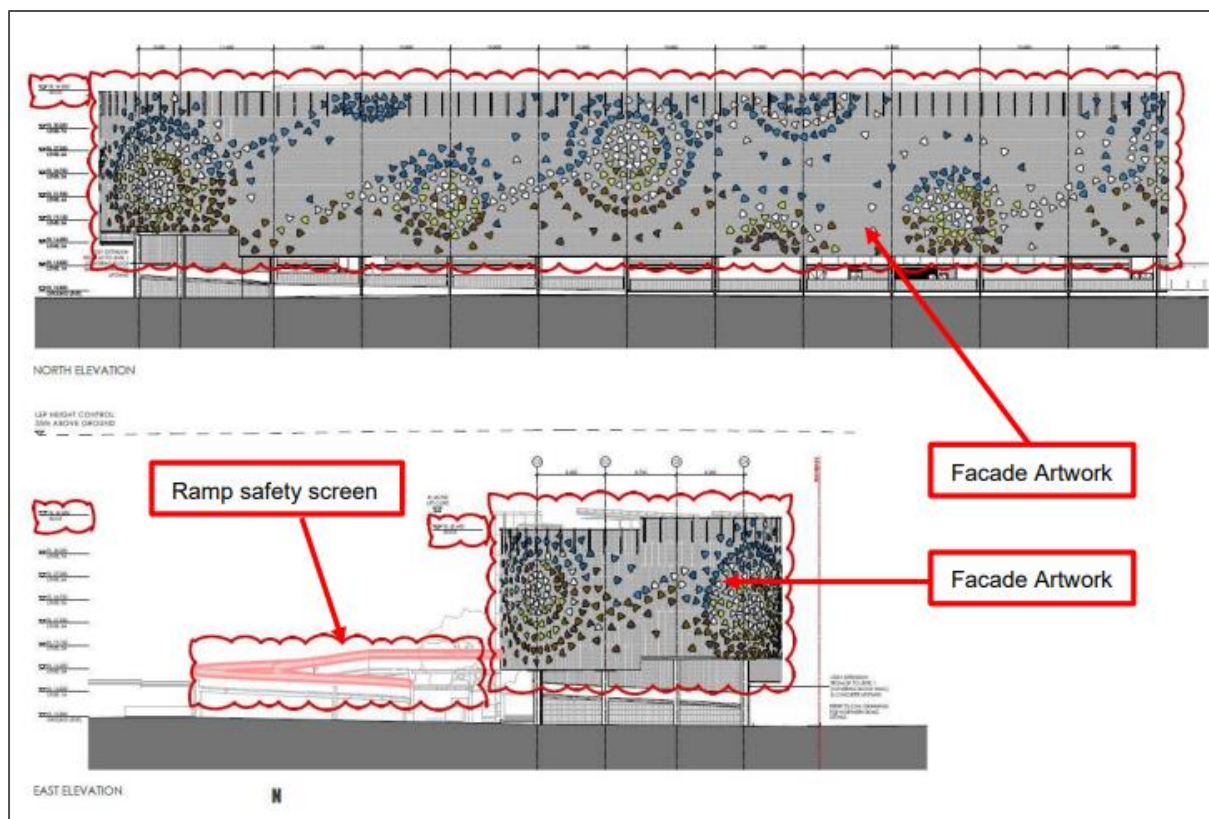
| Proposed façade amendments, north (top) and east (bottom) elevations (Source: Applicant's Modification Report 2021)
